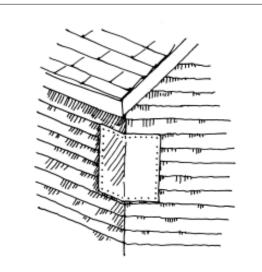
Raccoon access to rooftops can be eliminated by installing sheets of aluminum flashing, at least 3 feet square, around the corners of buildings.
